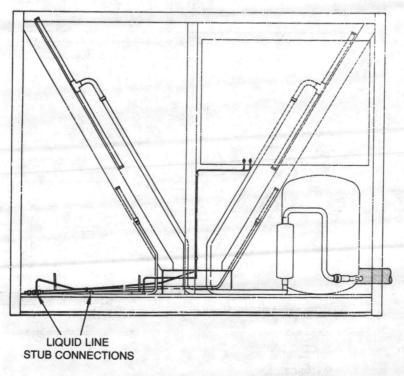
Piping Installation: 50 and 60-Ton Units Without Isolators
